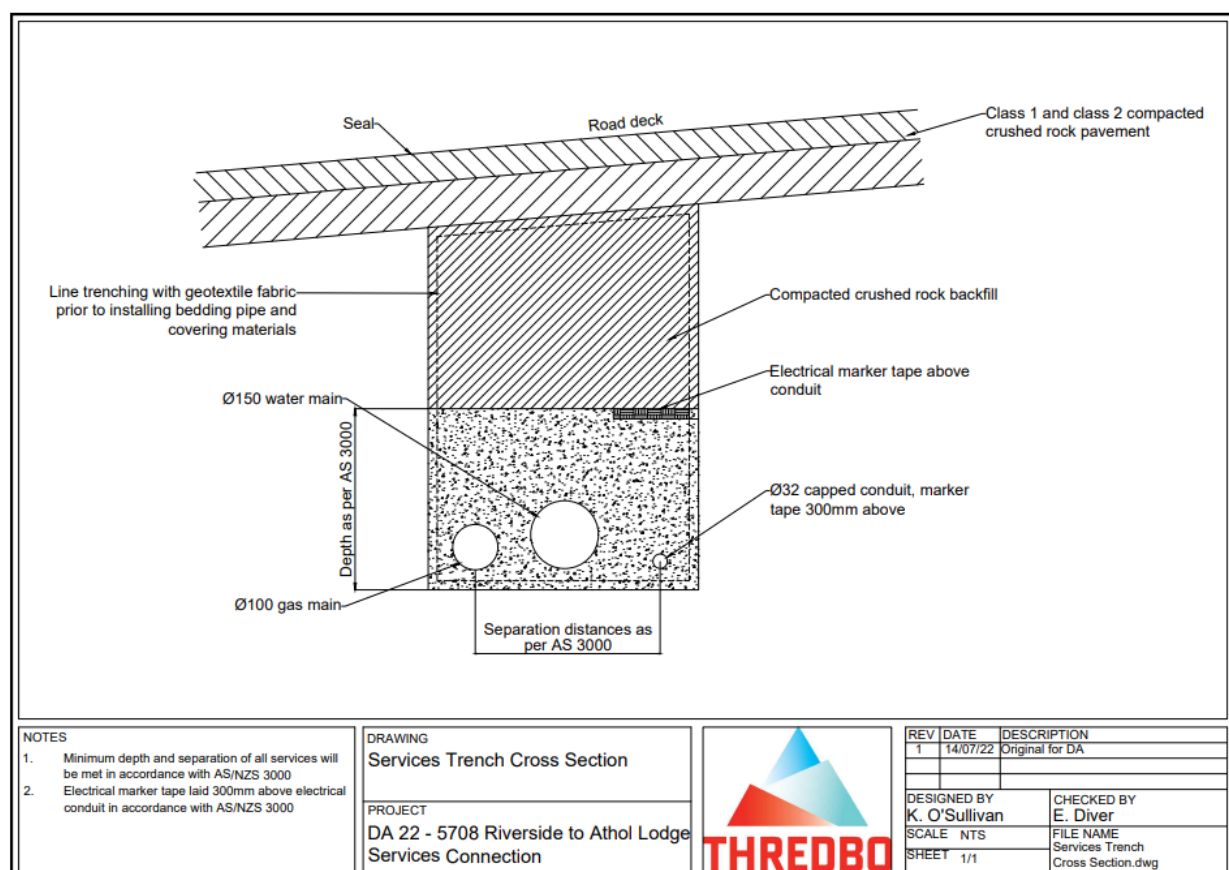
| Diggings Terrace Services Trench Cross Section Plan (Source: Applicant's documentation)
